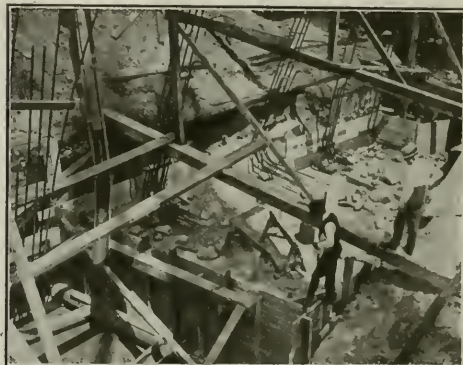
Footing of West Wing of North Abutment; Reinforcement Rods for Counterforts
